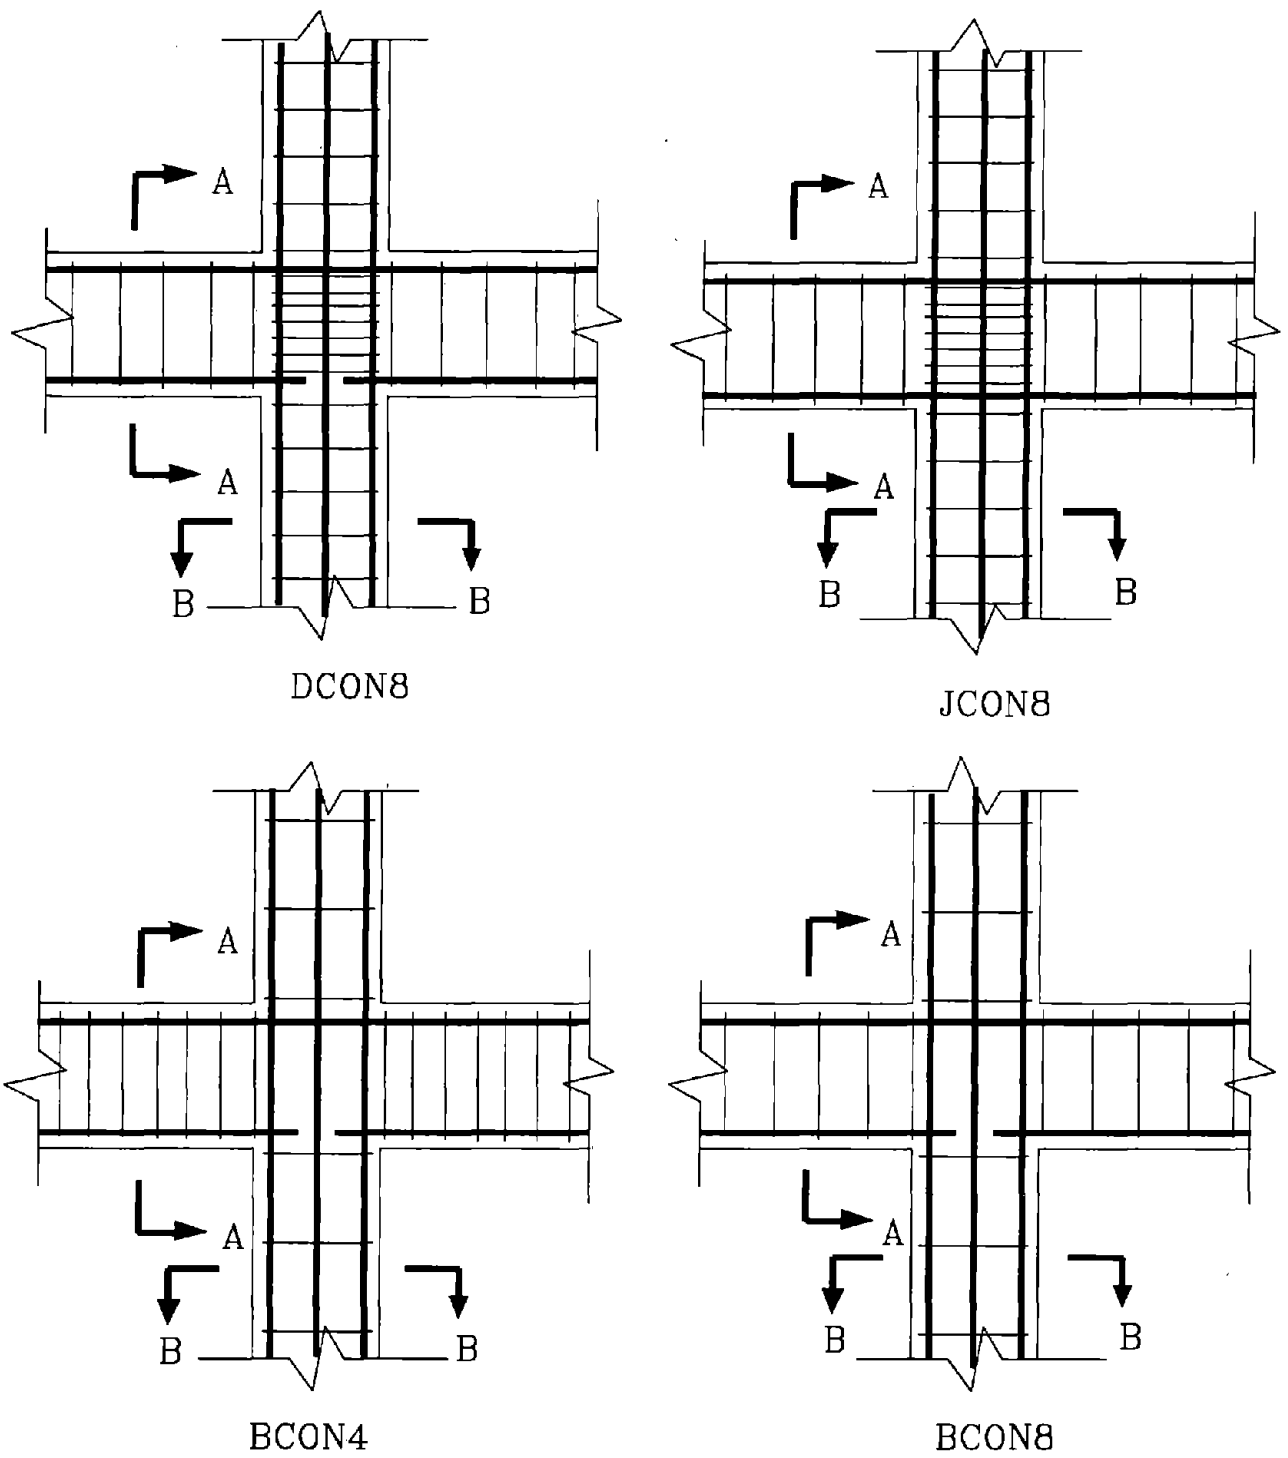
Beam-Column Joint Reinforcing Details (continued)
